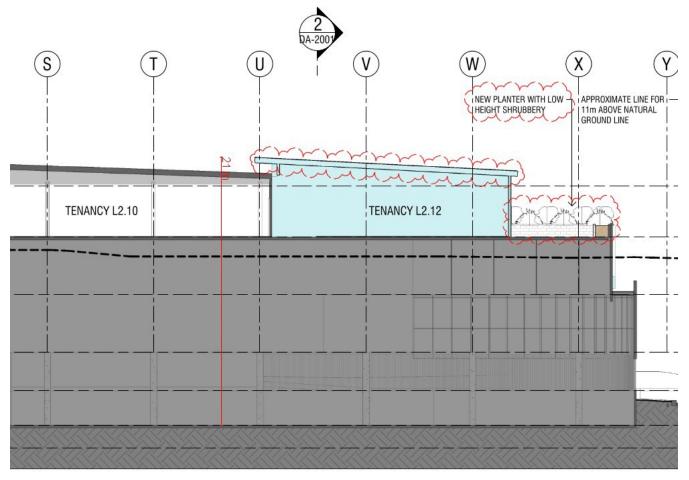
Part Section 1 with 21.0m maximum roof height annotation (Drawing DA-2001 prepared by Buchan Group).
